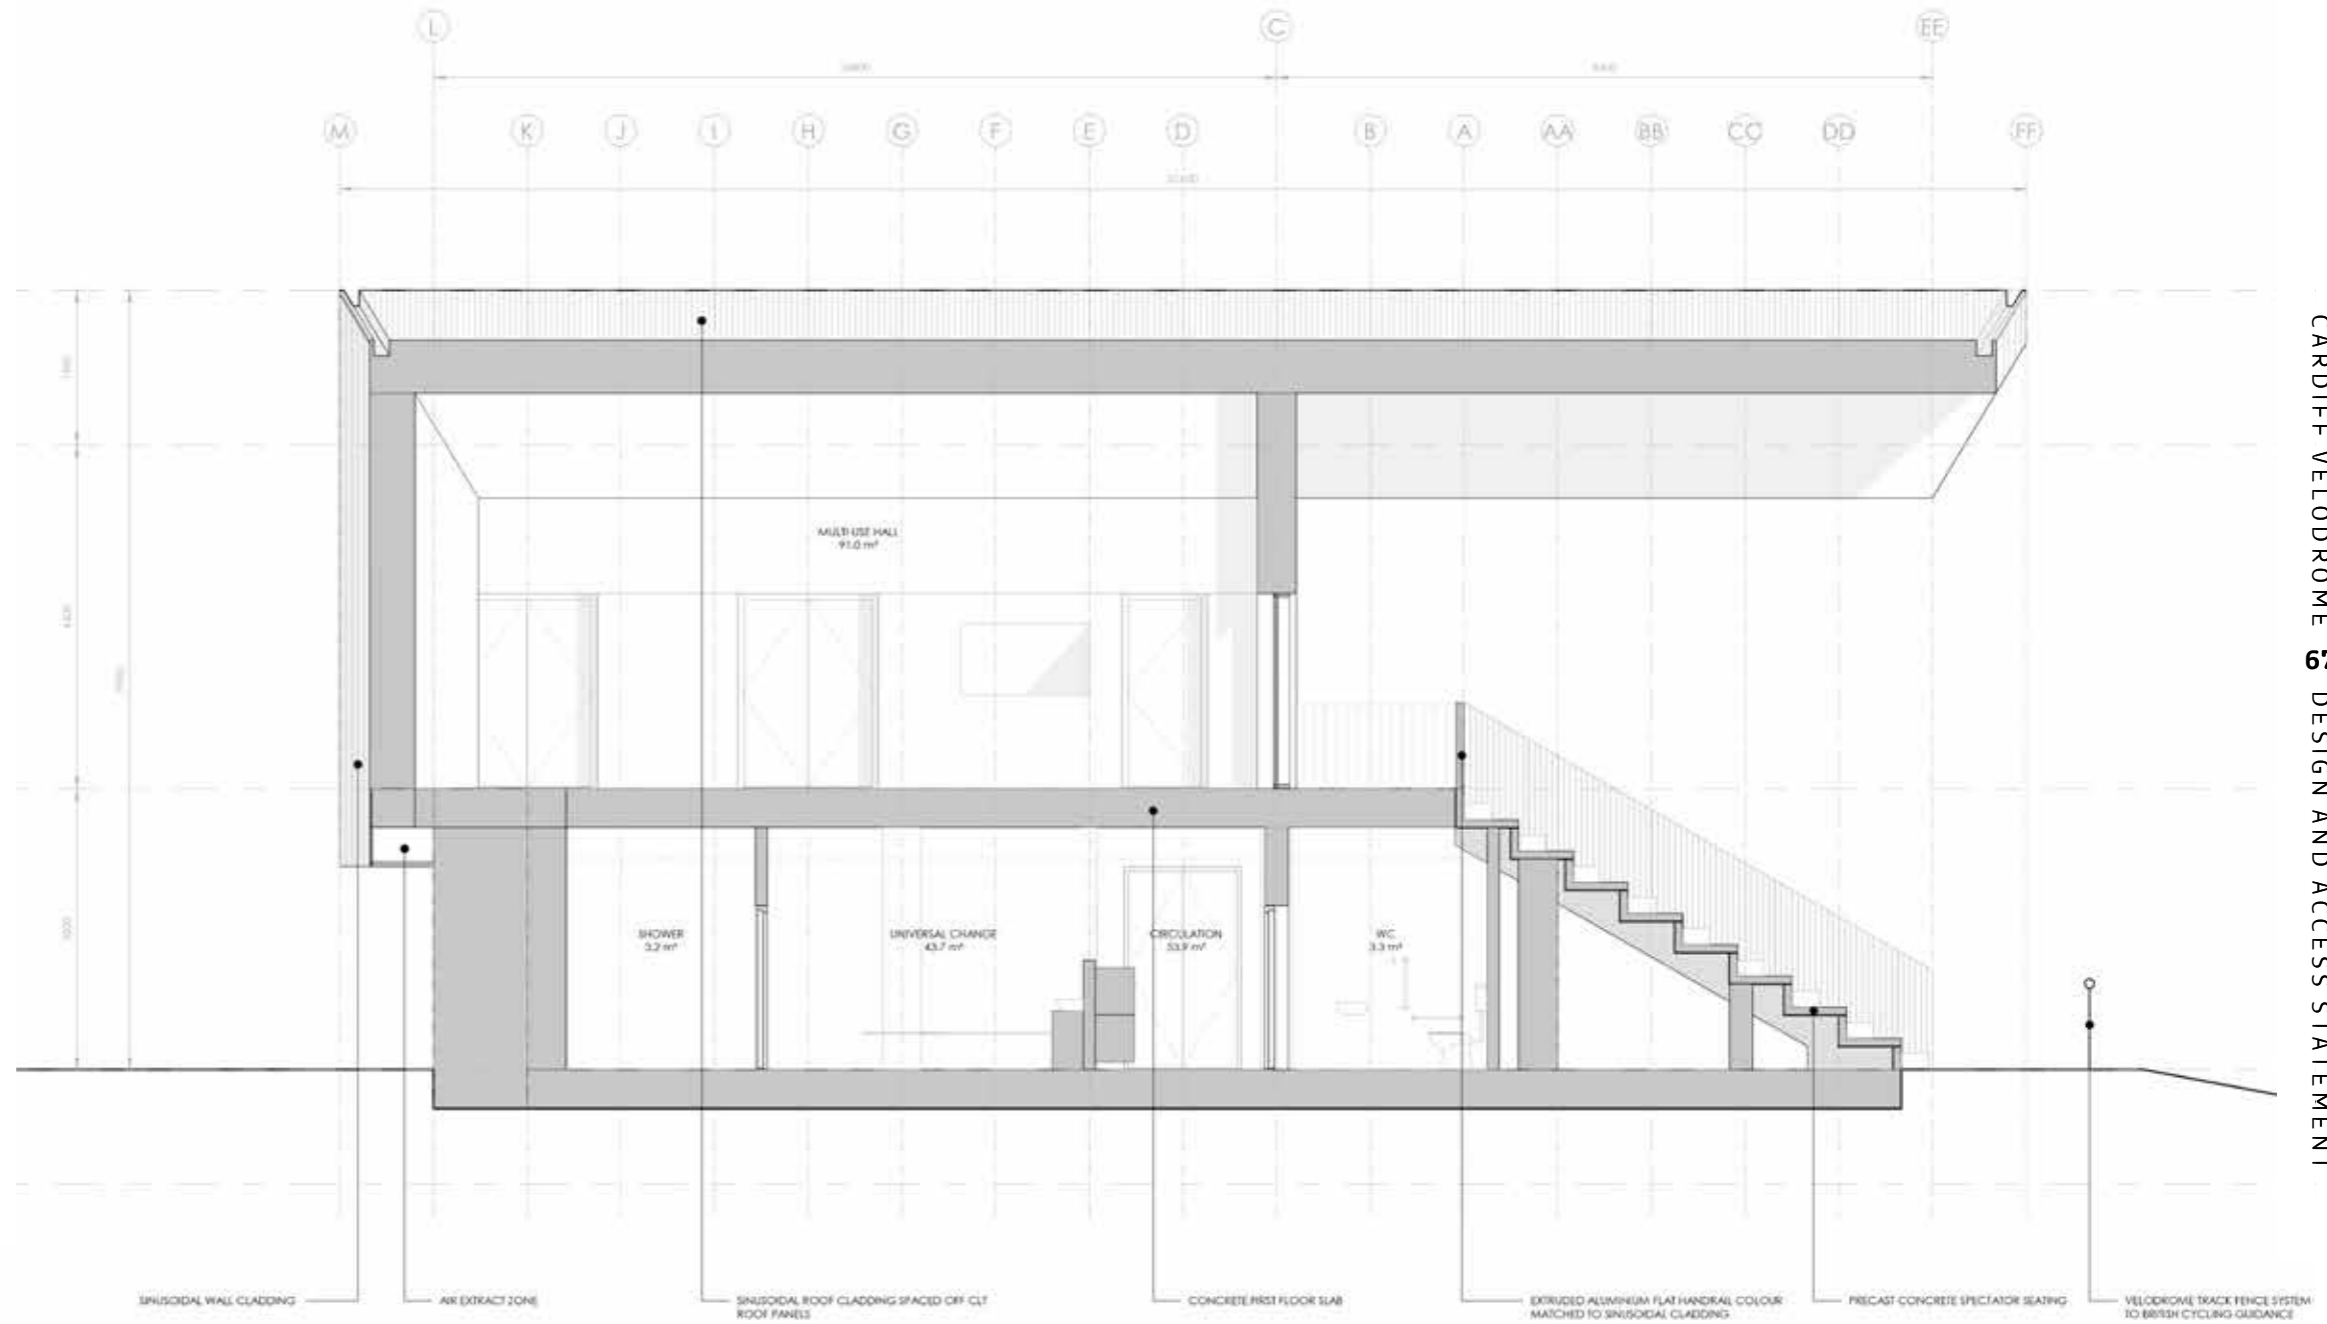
(above): Extract from drawing 3617-FBA-00-XX-DR-A-01\_31\_PROPOSED SHORT SECTION
